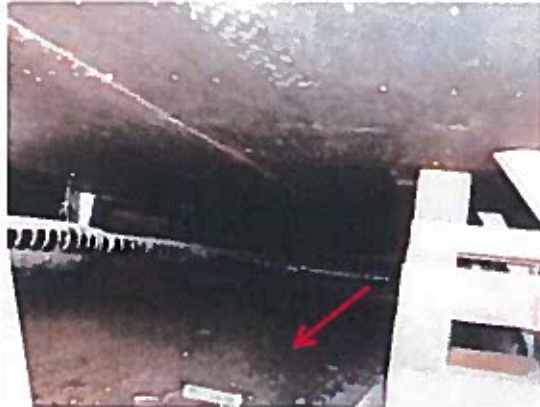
Opening up some crawl space grilles at Wapasu Creek West to view inside.
